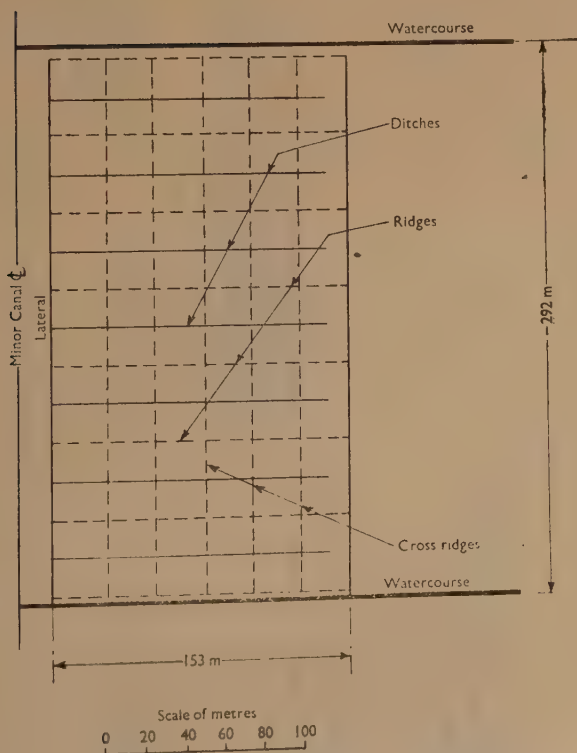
TYPICAL LAYOUT OF FIELD PLOT
